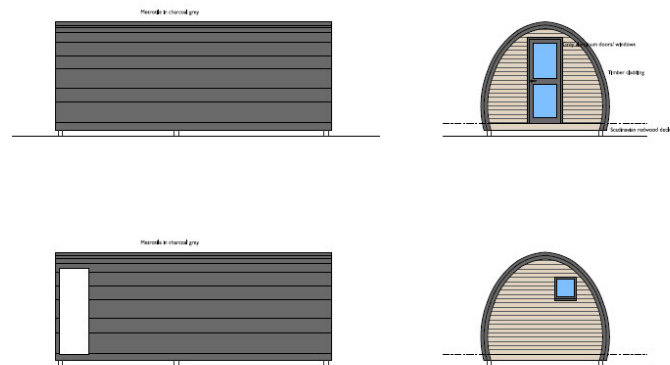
Proposed elevation treatment showing natural material palette and glazing to the door on the front elevation
